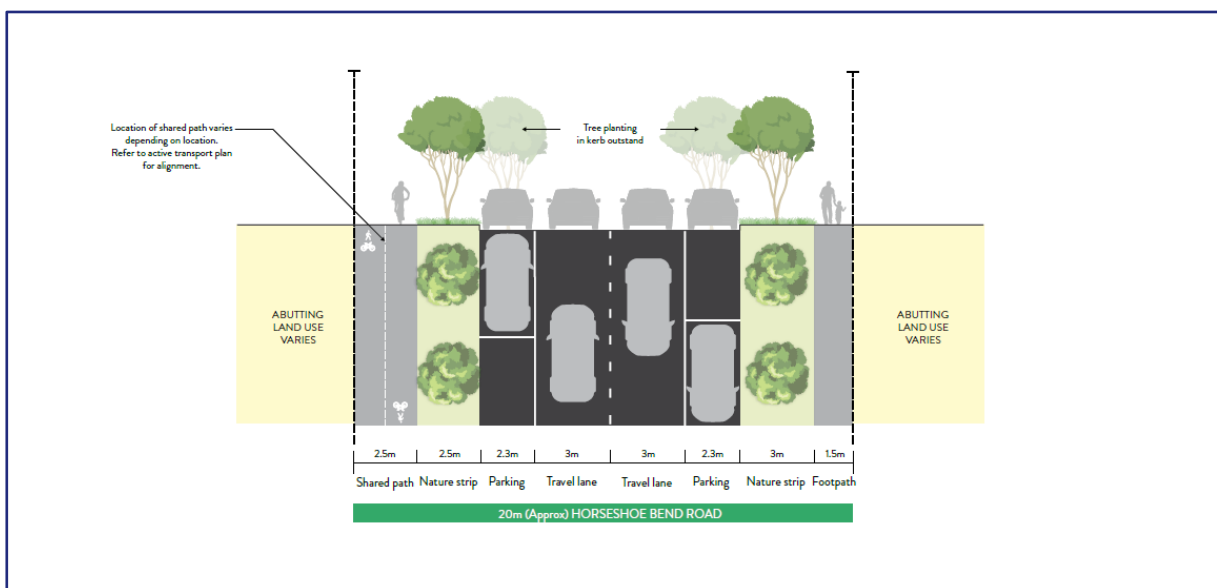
Exhibited PSP - Horseshoe Bend Road Cross-section
